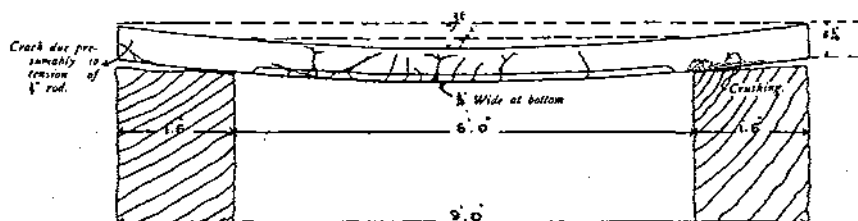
Beam Five Weeks after Removal of Load.—West Side.
